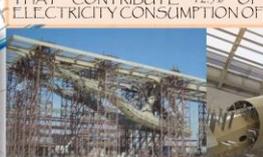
Roof deck and steel structure of the tree-shaped organic metal columns
